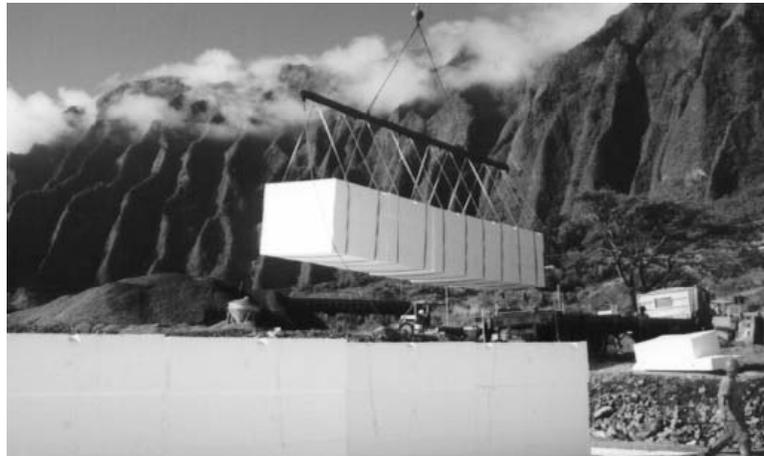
Emergency Ramp and High Embankment constructed using EPS Geofoam at Kaneohe interchange in Oahu, Hawaii
